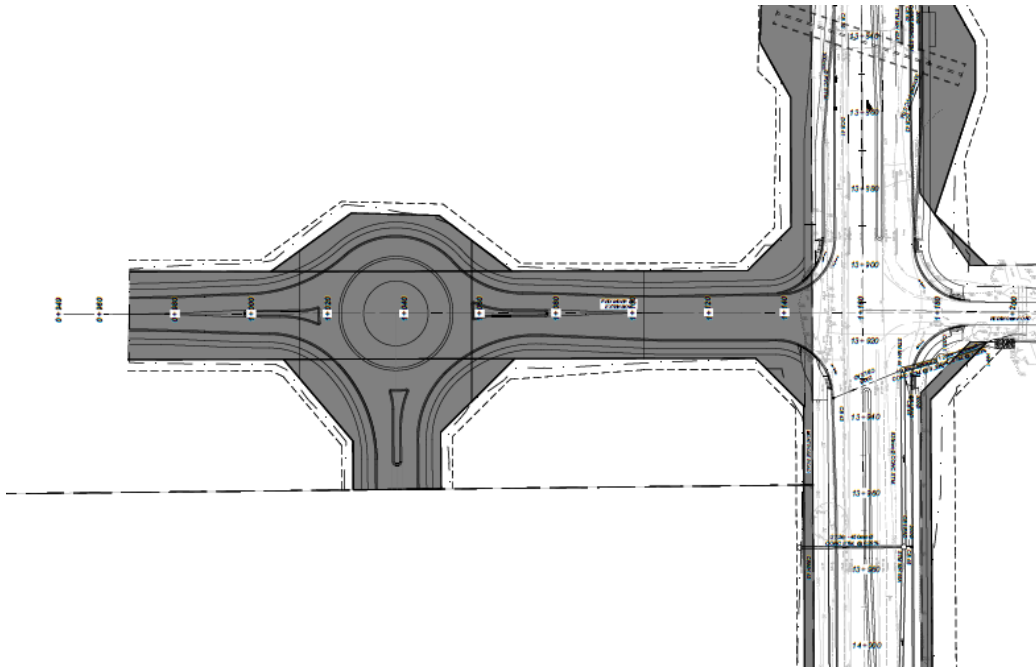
PROPOSED DESIGN OF THE REIXINGER ROAD EXTENSION
